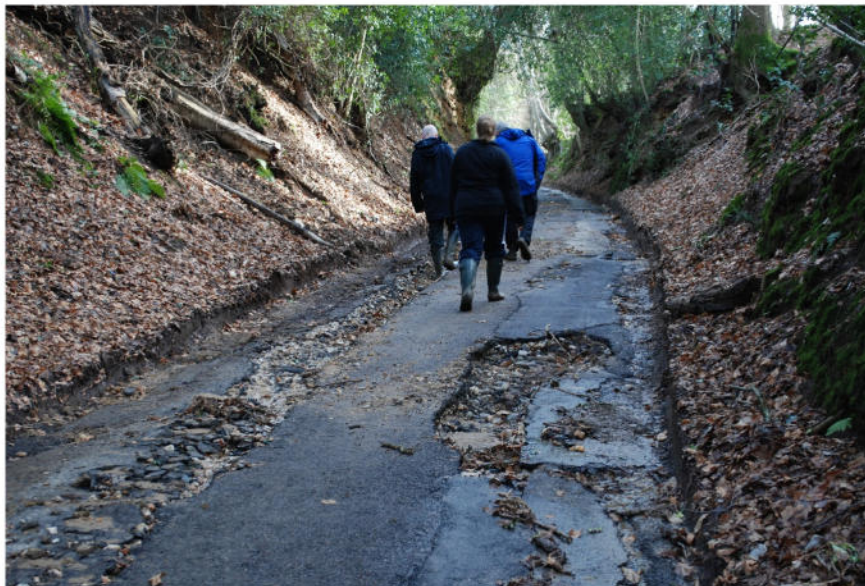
Damage to sunken lane, Hammer Lane, Iping, West Sussex.
